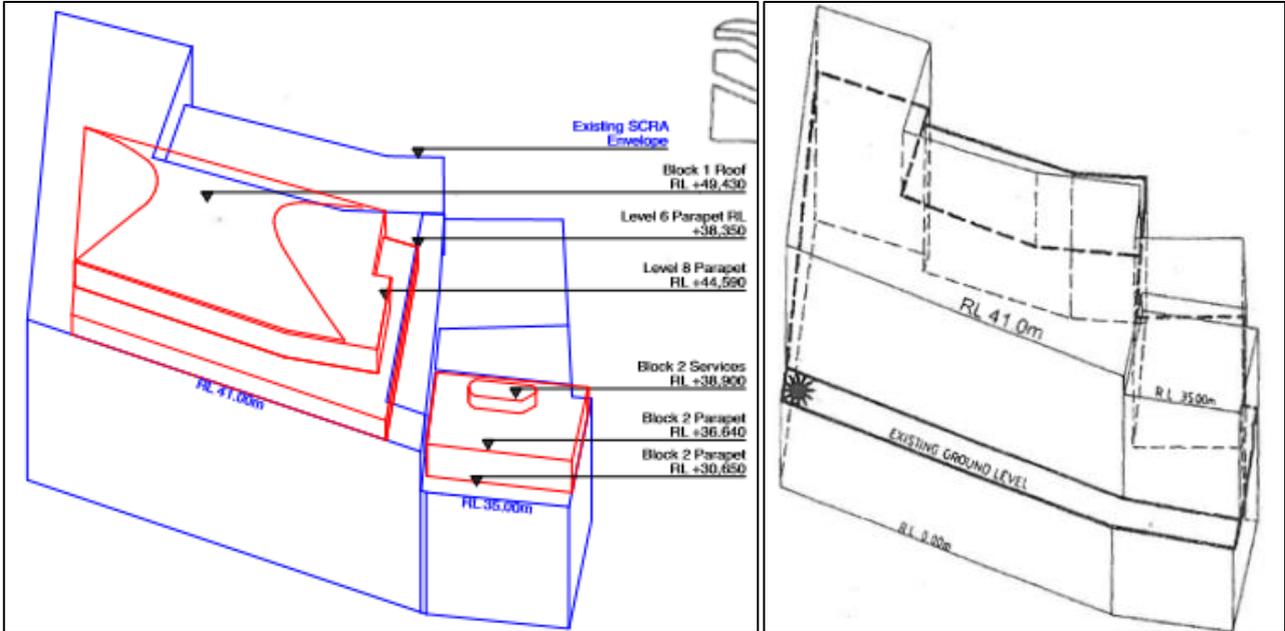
Proposed revised SCRA Scheme Building Site Control Drawing XXXV-A (left) and existing drawing (right). Red denotes areas outside the existing drawing envelope (Source: Applicant’s RTS)
